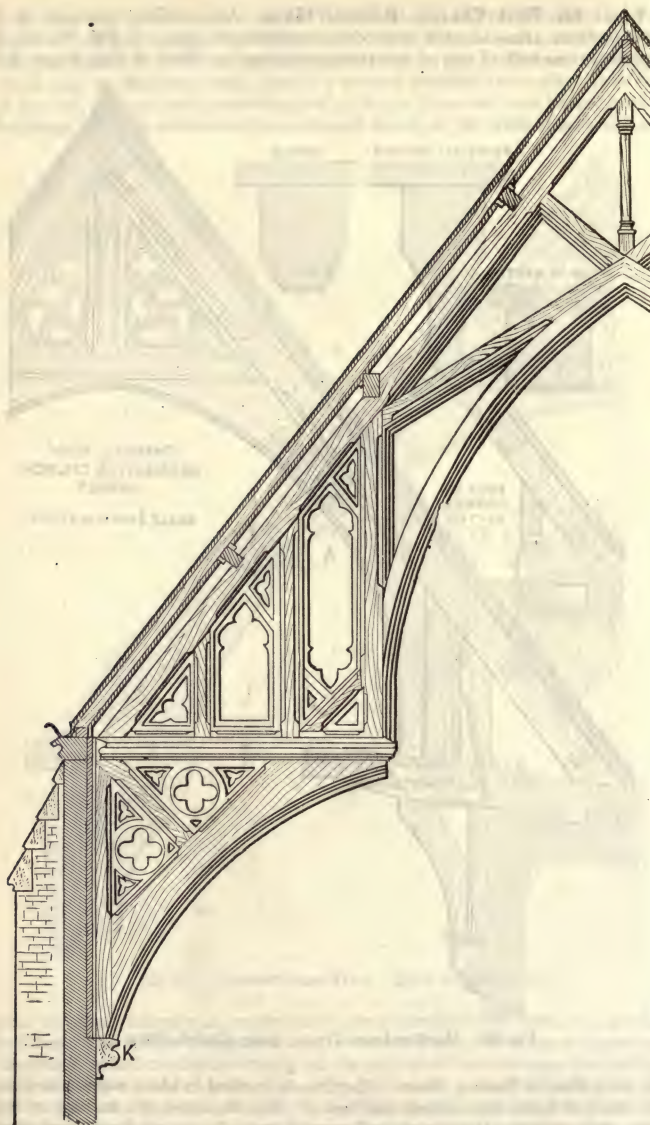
Hammer-beam Truss. First Church, Boston, Mass.
